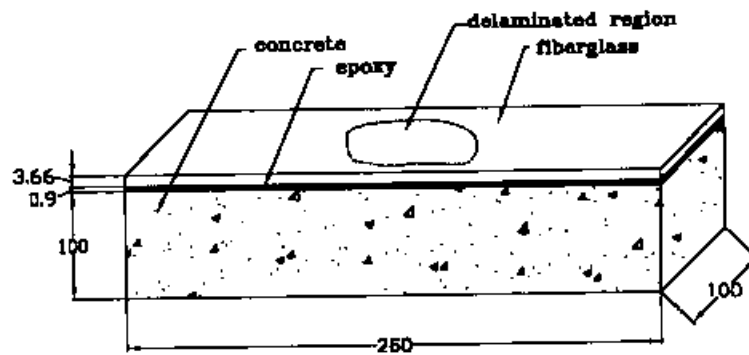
Geometry of the specimen—epoxy bonded concrete–GFRP plate.
